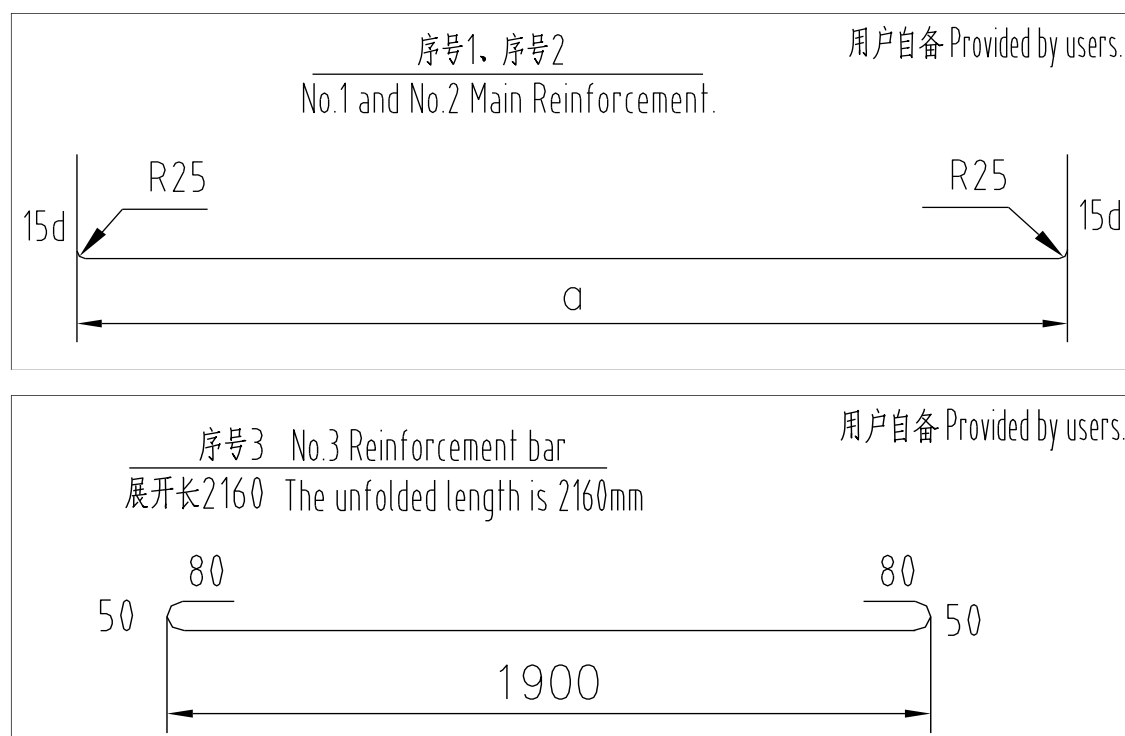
Foundation drawing of outrigger stationary tower crane
